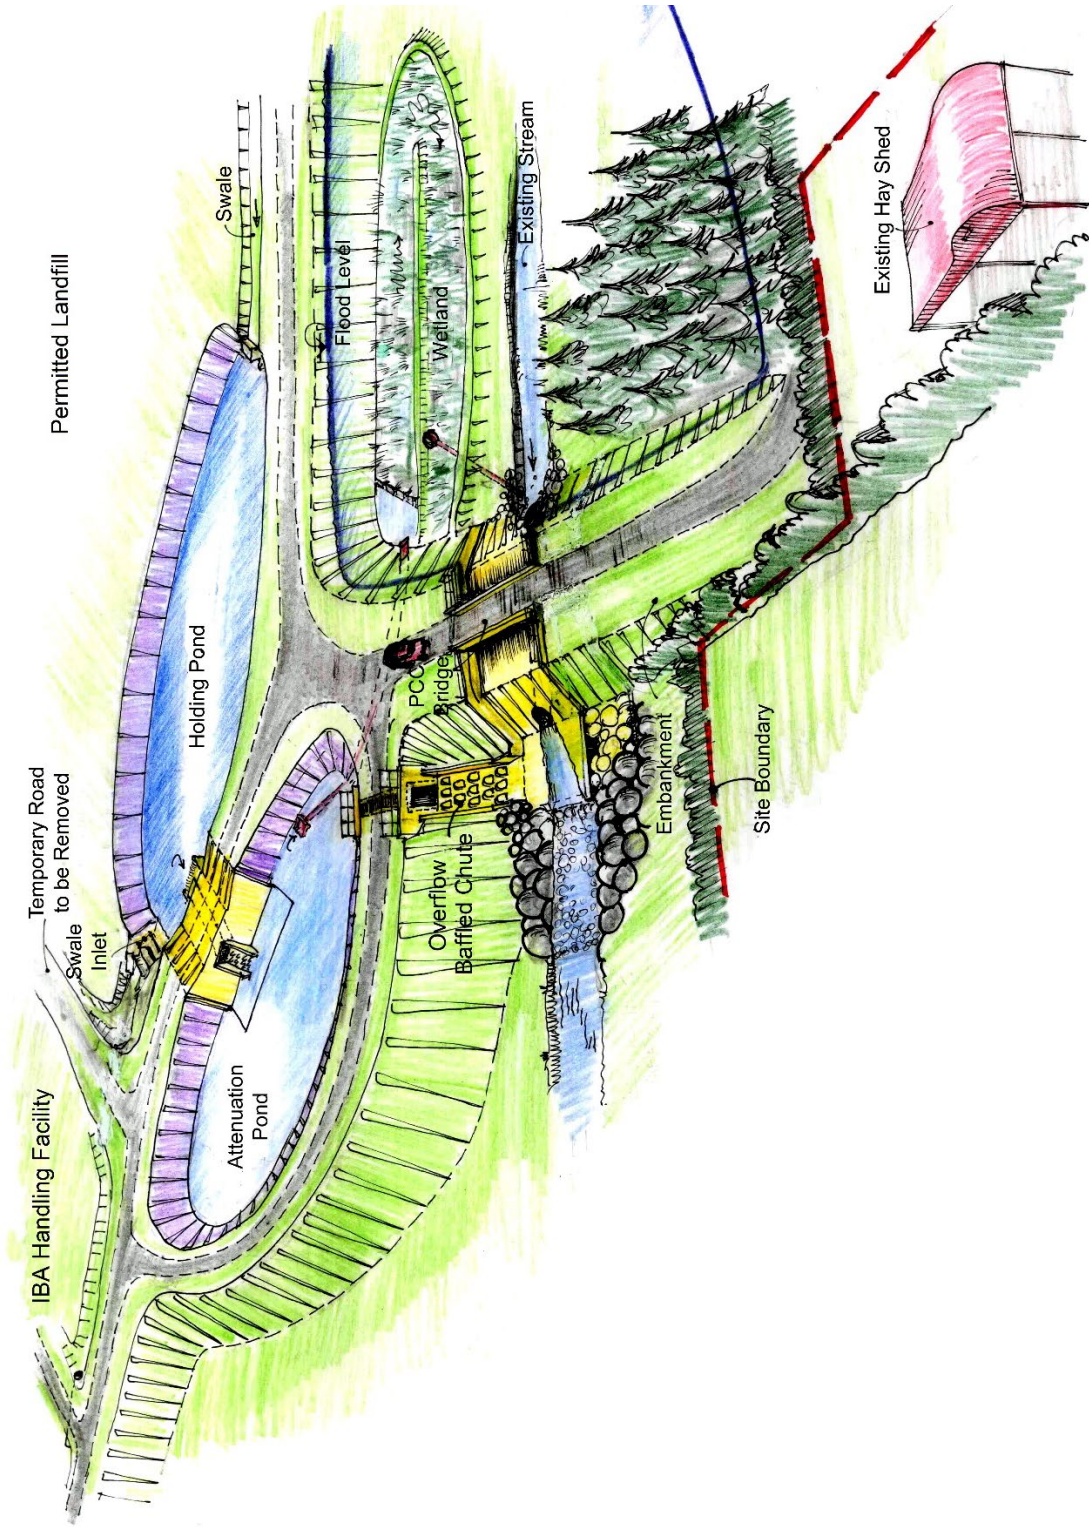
Artist Impression Northern Stormwater Attenuation Pond and New Flood Area
